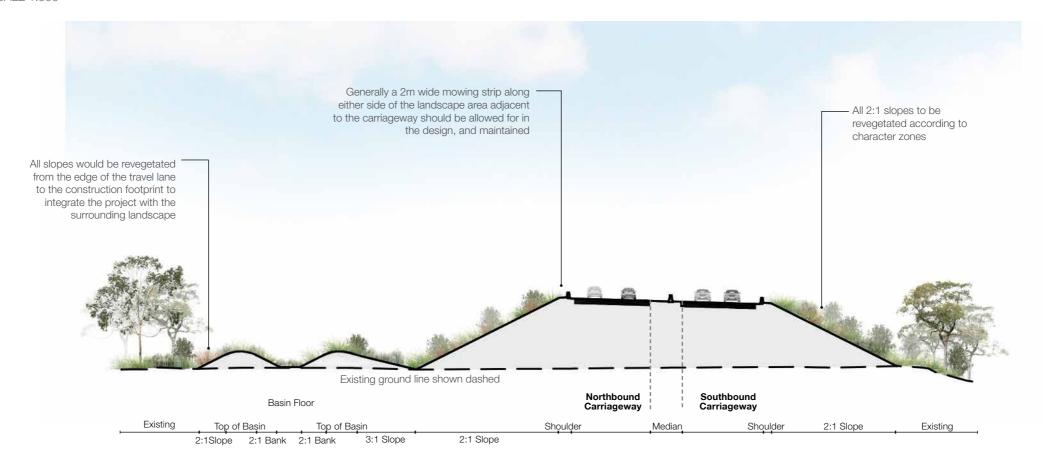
SECTIONTHROUGHMAINCARRIAGEWAYONFILLAPPROACHINGBRIDGE-CH12100(MCN1)
